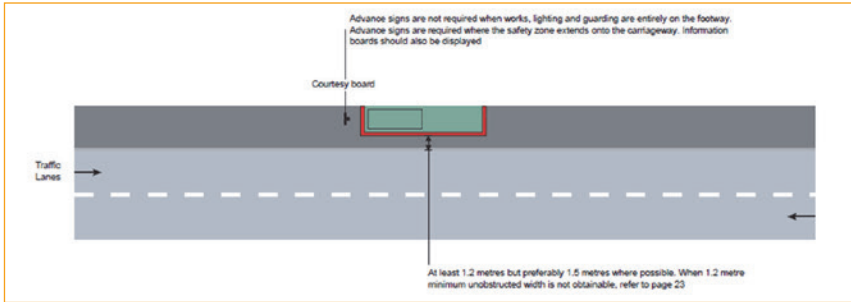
WORK ON FOOTWAYS (LHS)
